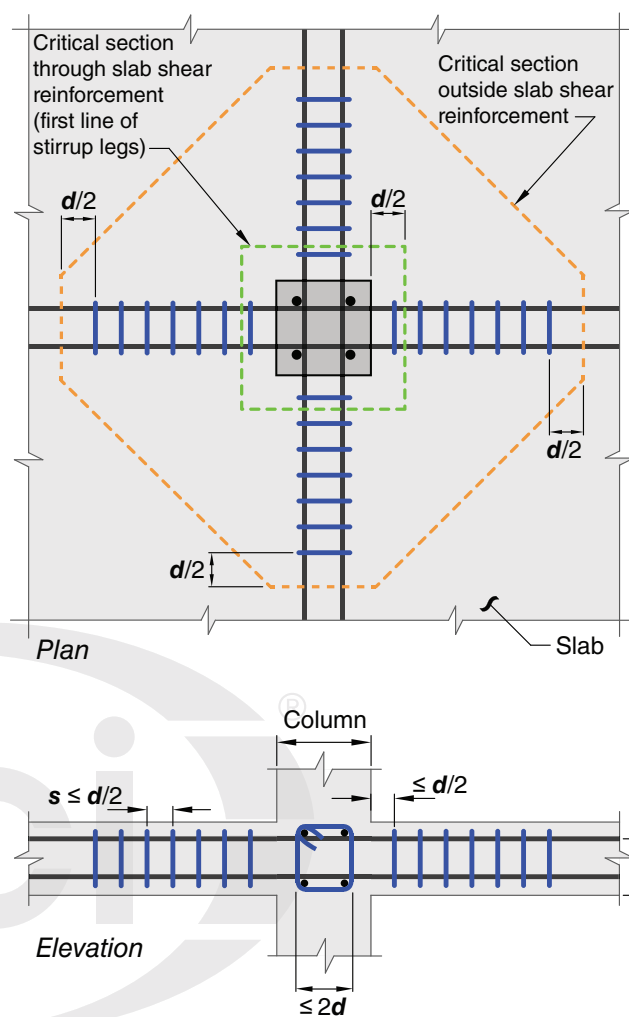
(e)—Arrangement of stirrup shear reinforcement, interior connection.
